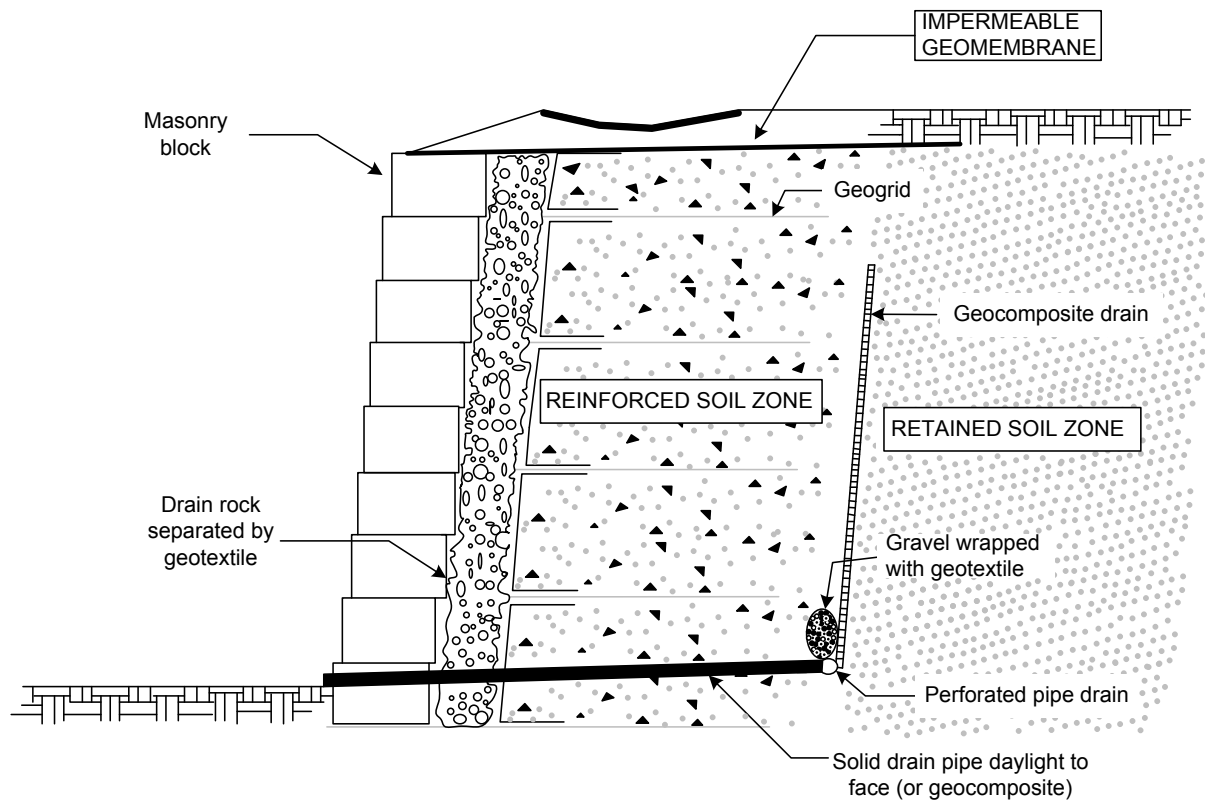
Use of a geomembrane as waterproofing above the reinforced soil zone (Koerner & Koerner, 2011)
